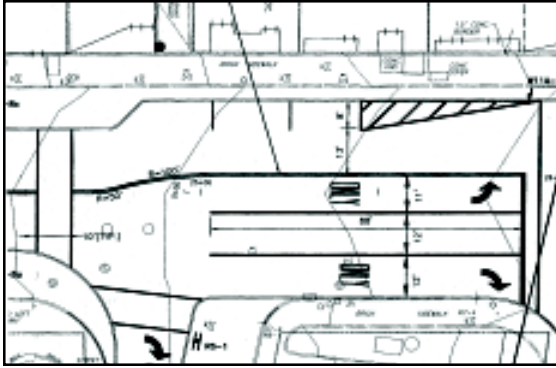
Plan at Valley Street/Scotland Road.
